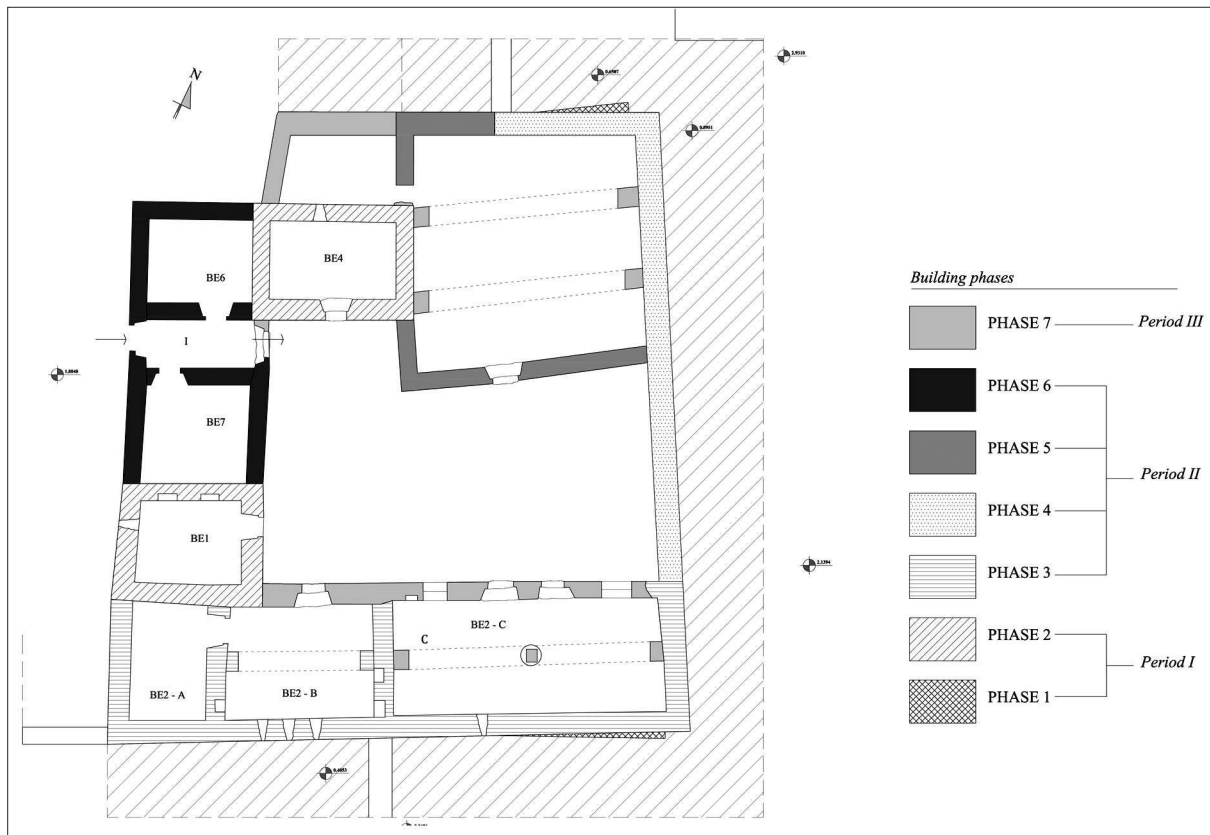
TU 24, plan of the Period III, Phase 7, that shows the multiple activities of construction © P. Gilento.
